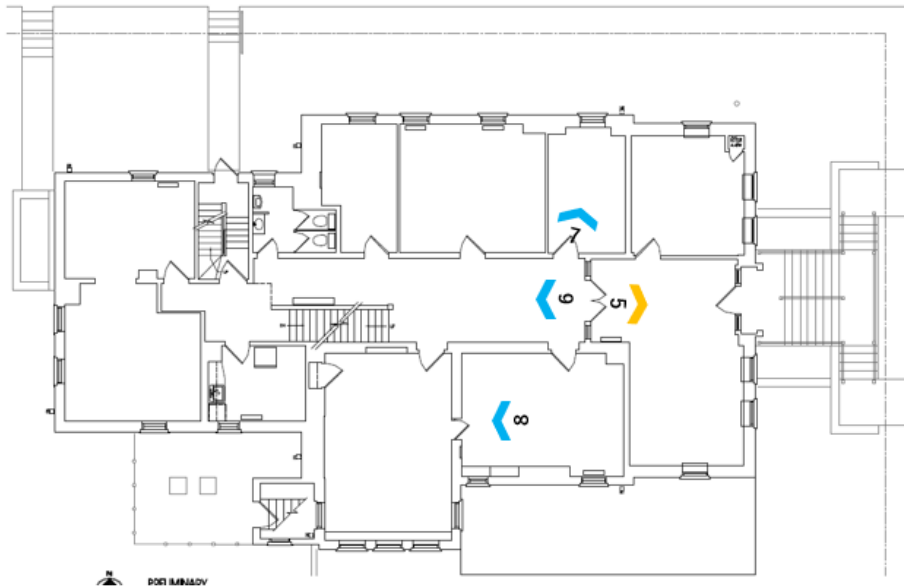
First Floor Photo Key Plan (Photos 5-8)
